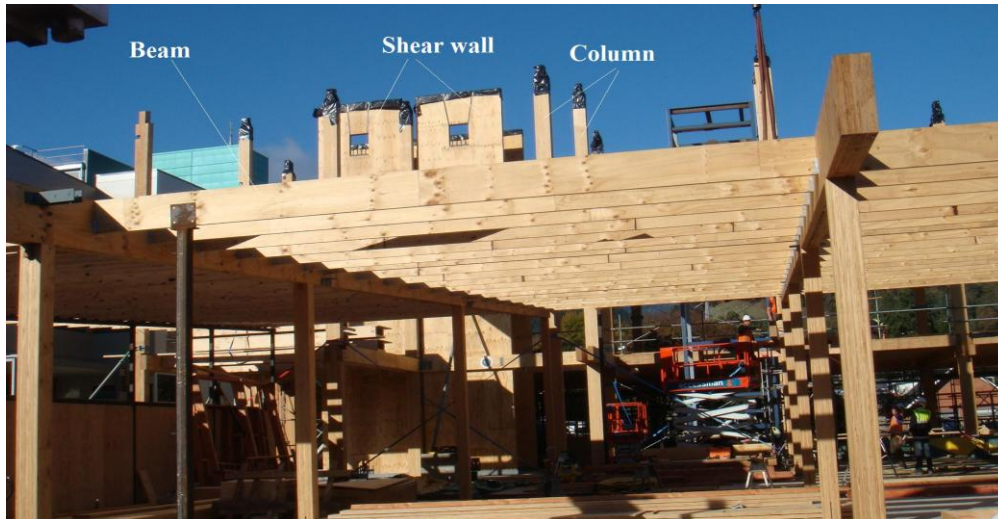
Use of LVL in shear walls, columns and beams (NMIT building Nelson, NEW ZEALAND)
